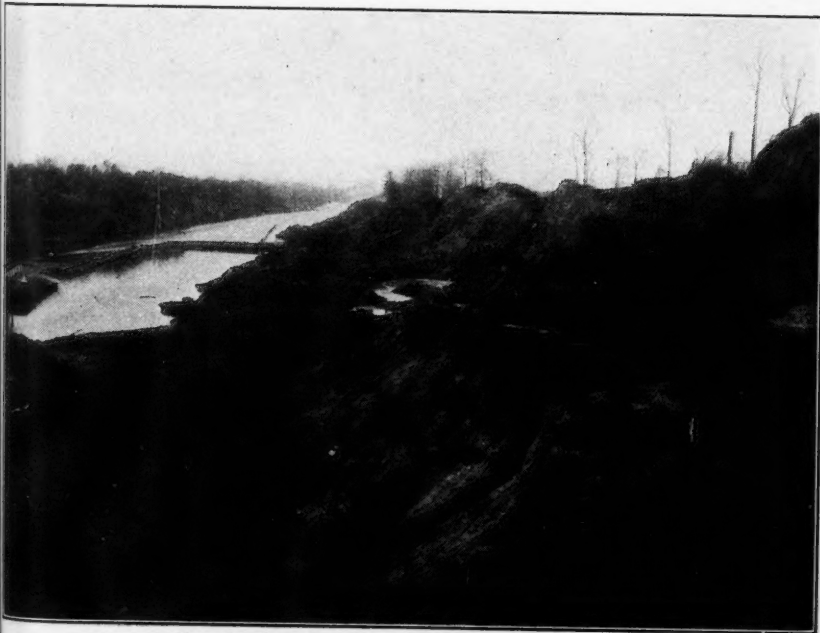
VIEW OF SLIDING BANKS IN SECTION C.
